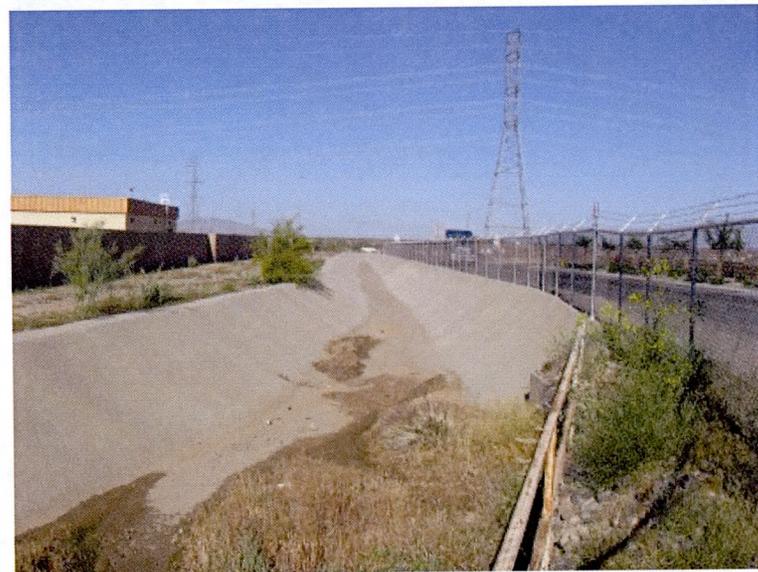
Facing west, southwest corner of the intersection at N. 111th Ave. and W. Beardsley Rd.
